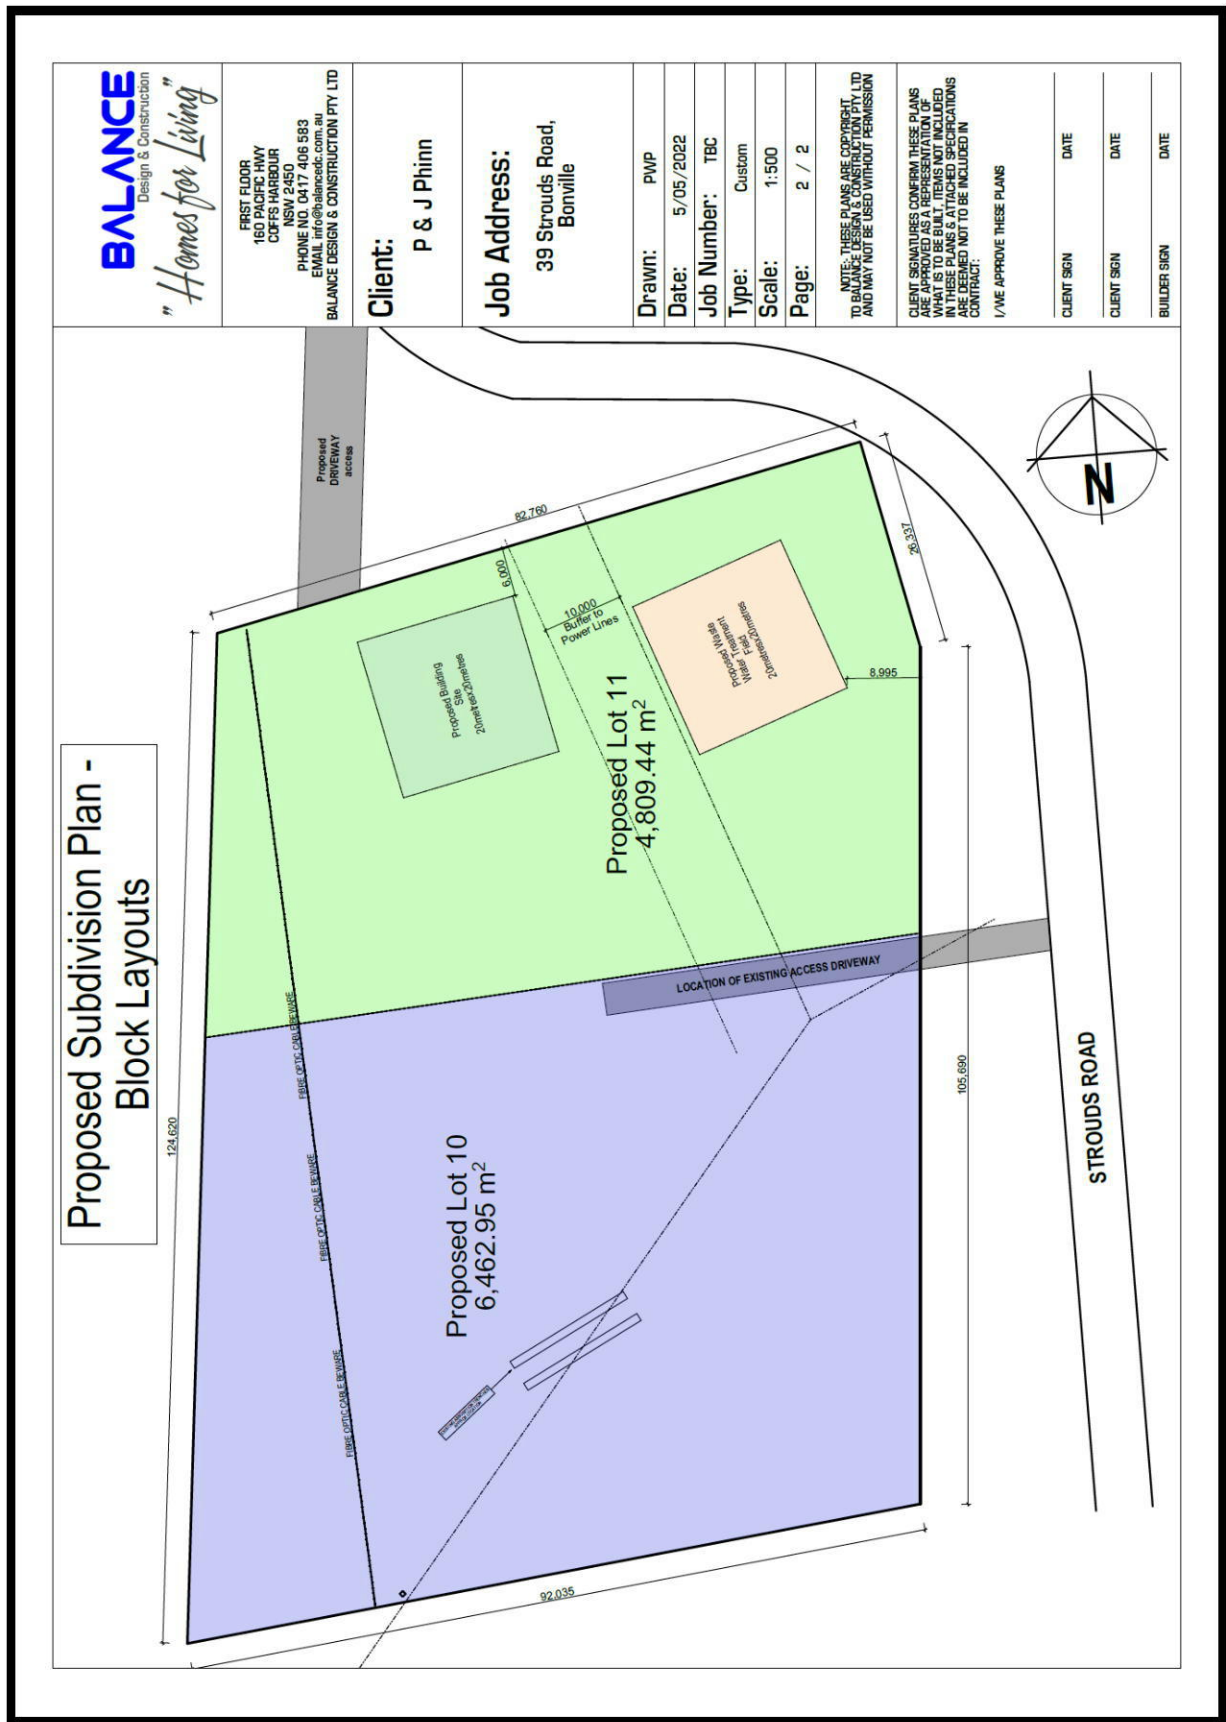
proposed subdivision plan (Balance Design & Construction, 5/5/2022)
